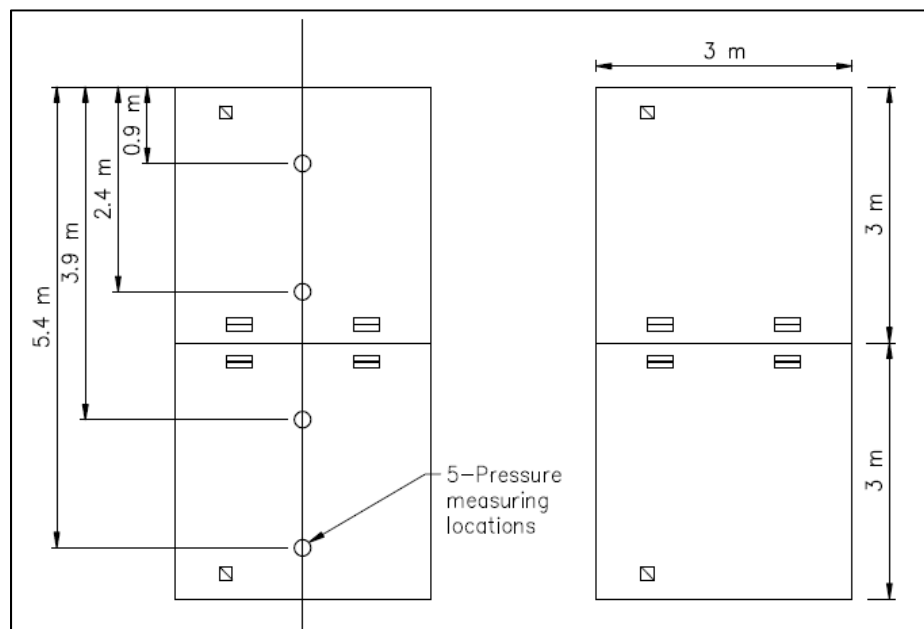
Trench box supporting wall side views and pressure measuring locations from the top
